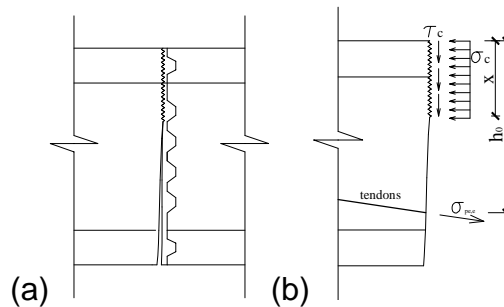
Simplified failure mode for epoxied Joint under combined shear and bending: (a) Failure mode; (b) Forces in failure plane
